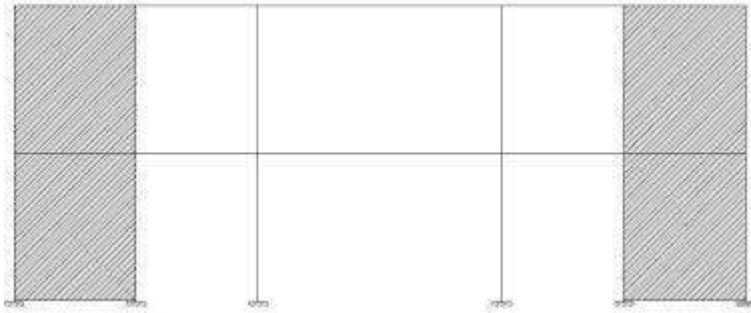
Frames with Shear Walls and Reinforcement Concrete Columns Side View
